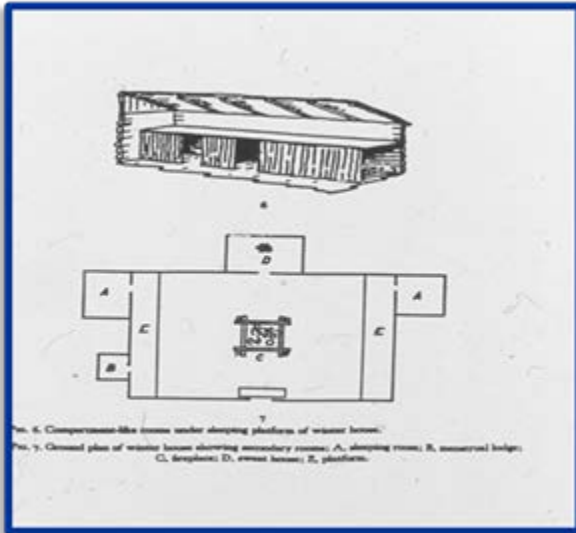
Dena'ina house interior with sleeping bench against the wall & main room with small additional rooms and central hearth. Most upper Cook Inlet houses only have one separate room used as a sweat house.
